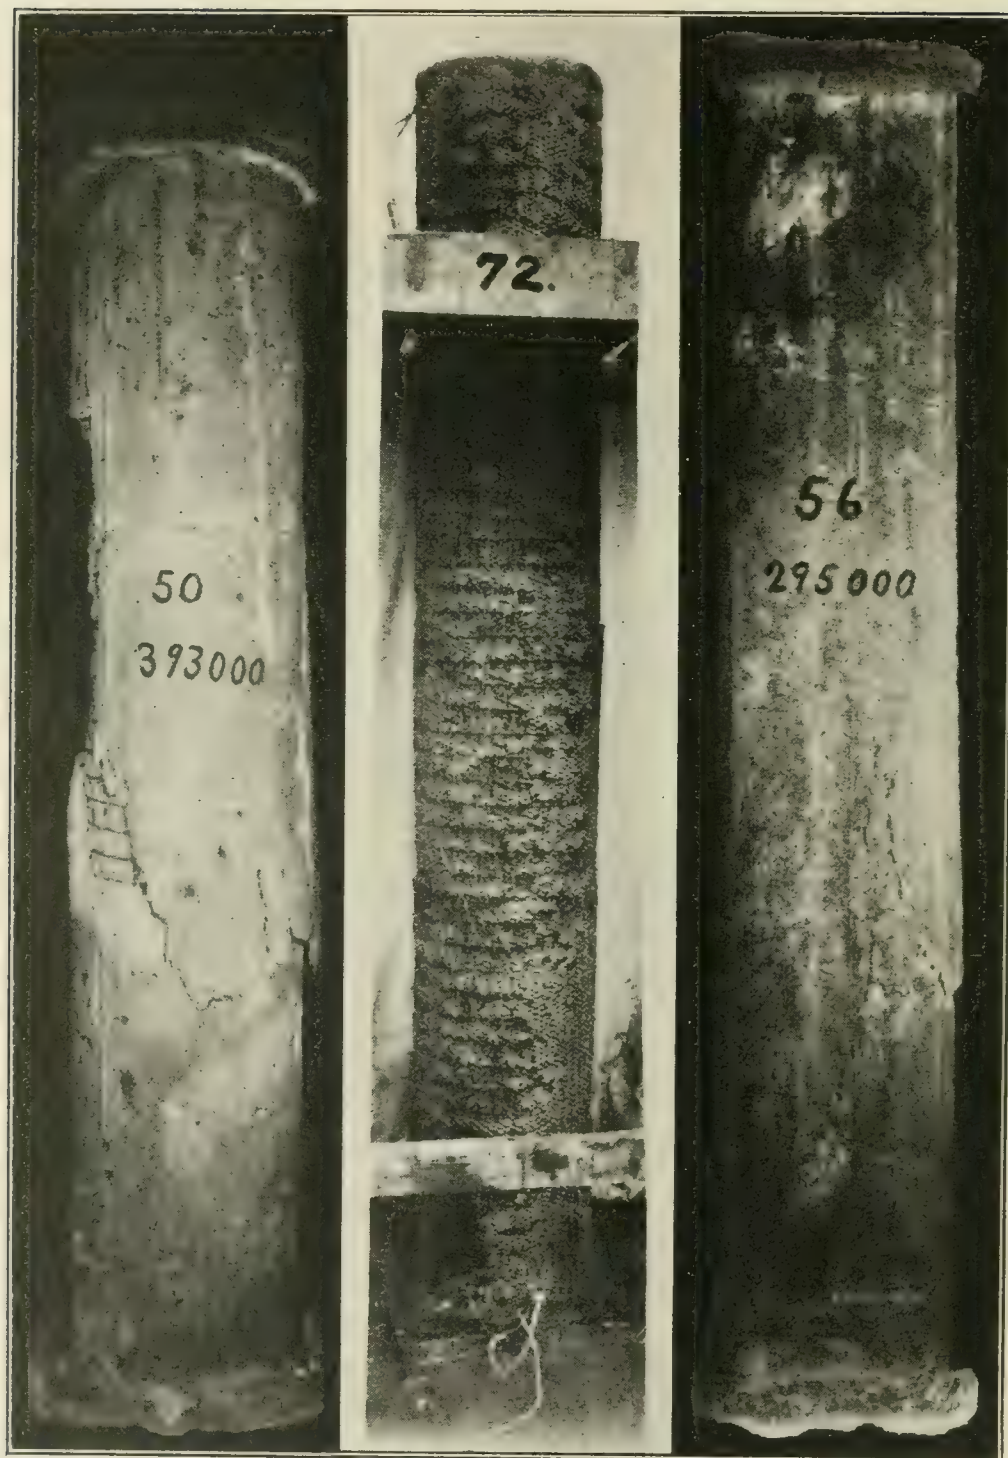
RESULTS OF FIRE TESTS ON CONCRETE COLUMNS.
